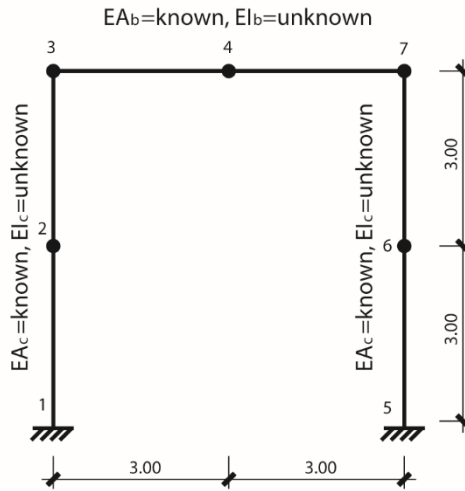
A one-story, one-bay frame with two columns and one beam (unit: m)
